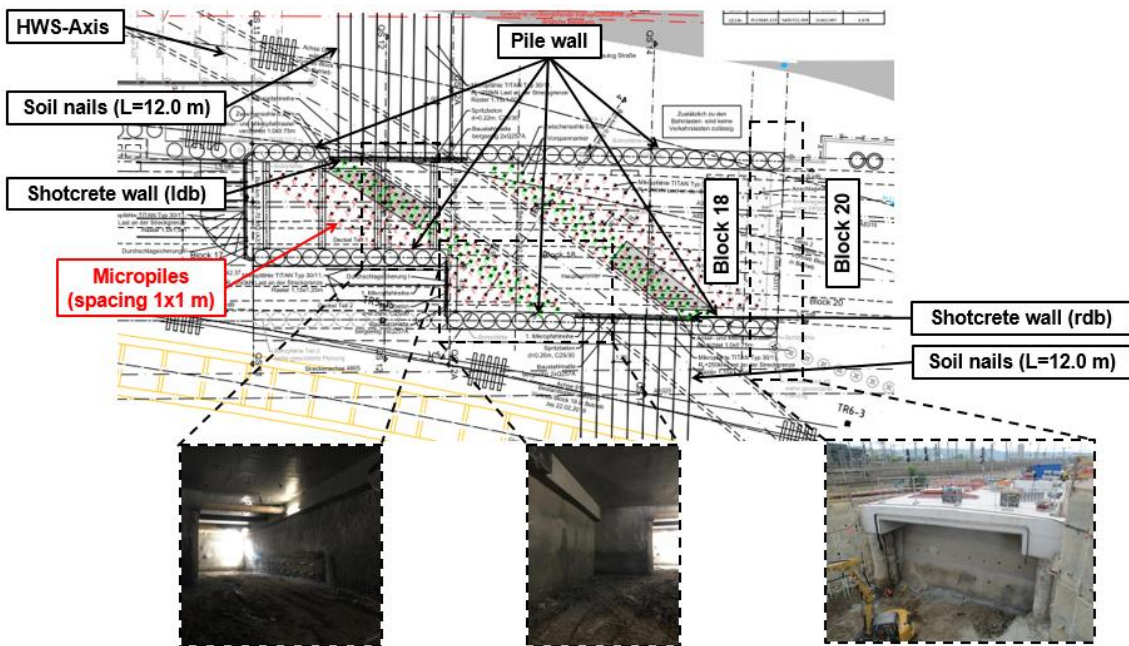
Plan view of Block 18 covering structural elements and on-site photos
